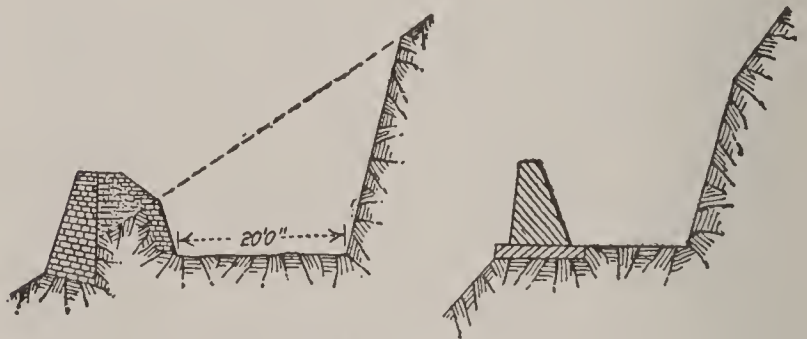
CANALS ON ROCK SLOPE WITH RETAINING WALLS.
